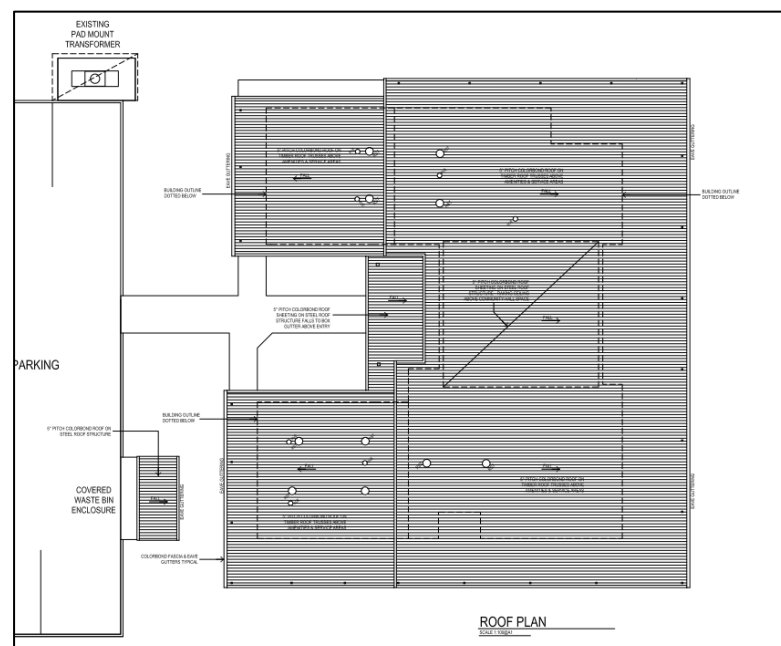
Roof Area (excerpt from Peter Turner Plan A04)
